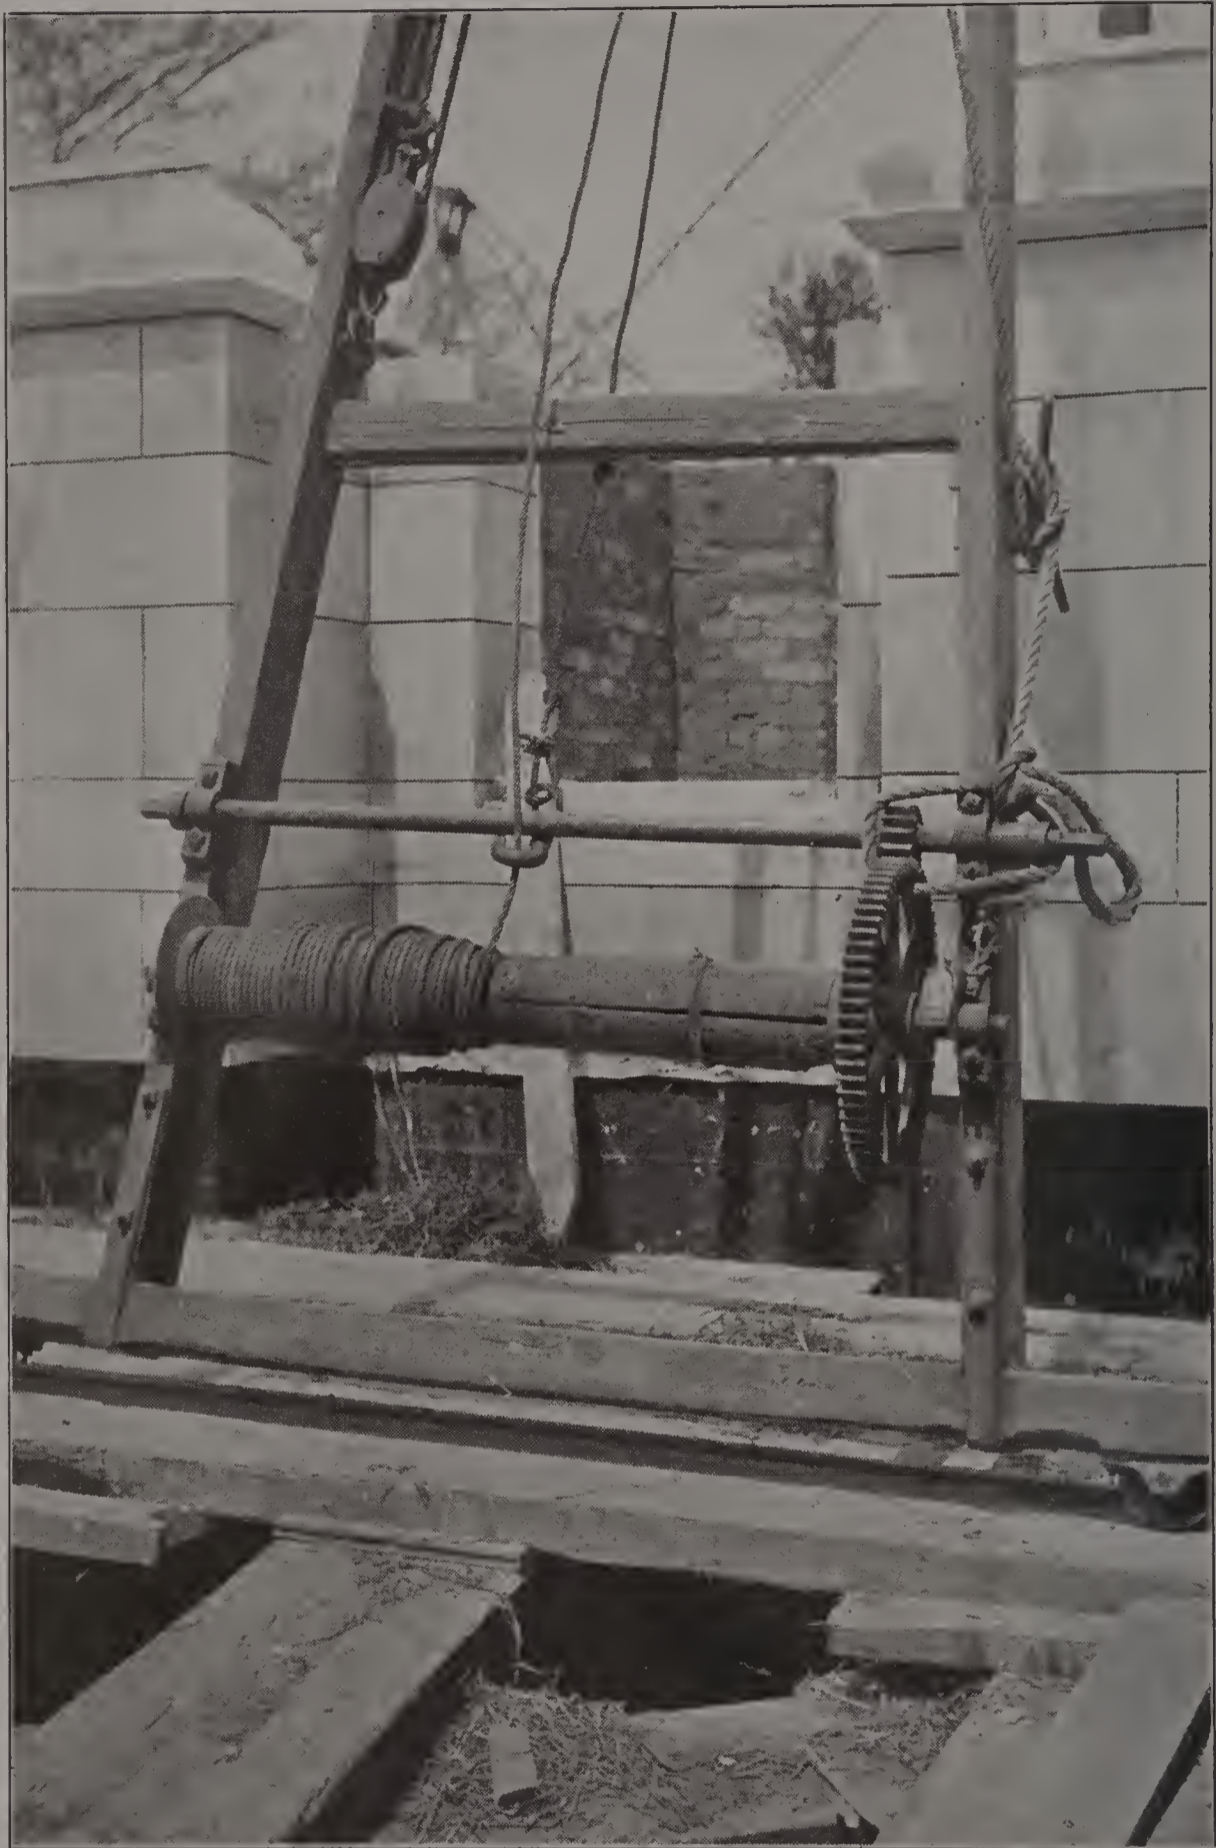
A BREAST DERRICK WITH UNPROTECTED GEARS.
